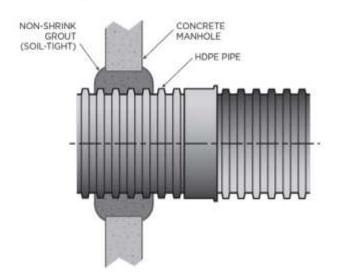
Detail of manhole adaptor connection for existing manhole structure
